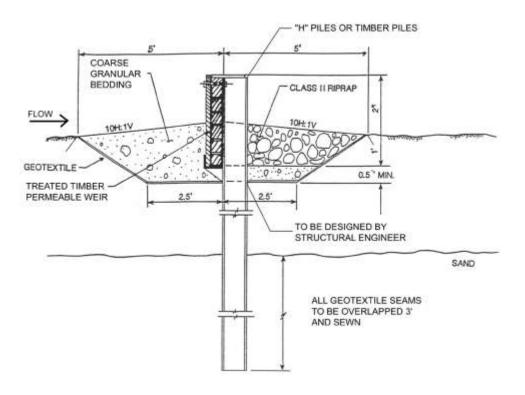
Typical Permeable Weir Cross Section Schematic (Cited by Barr Engineering, Co., 2003; Source: Klein, 1997)
